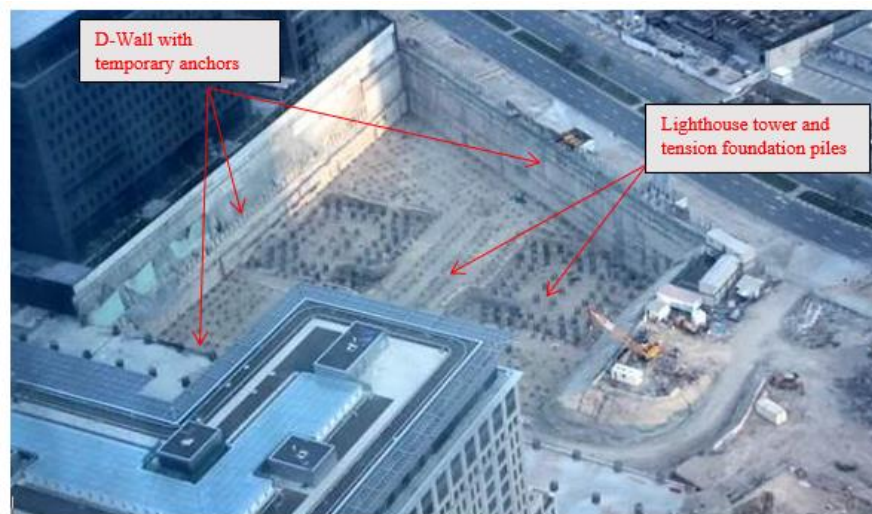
Completed enabling works (2009) for the previous Lighthouse Tower development.
